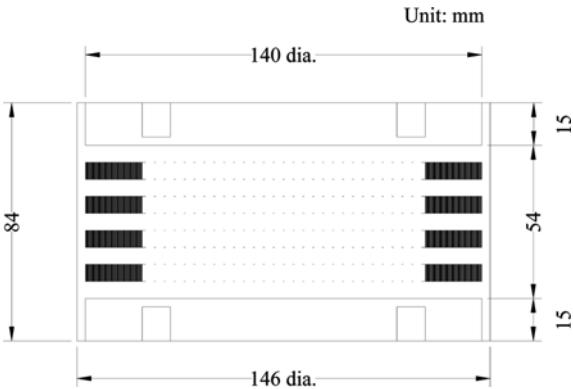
Schematic of stirrup rubber bearing (SRB)
